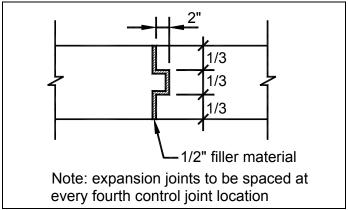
TYPICAL EXPANSION JOINT DETAIL
